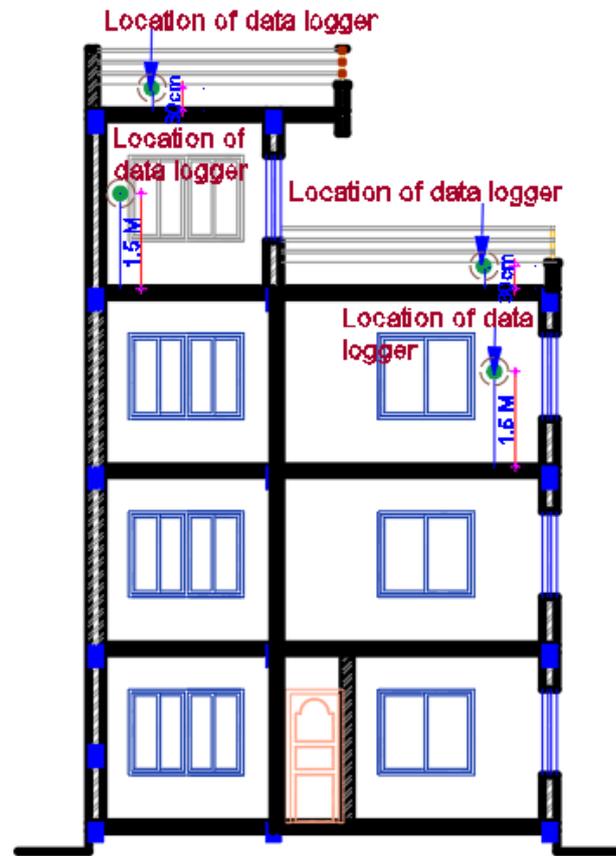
Building section of case 3 building with locations of data logger in indoor and outdoor of building for air temperature measurement.
